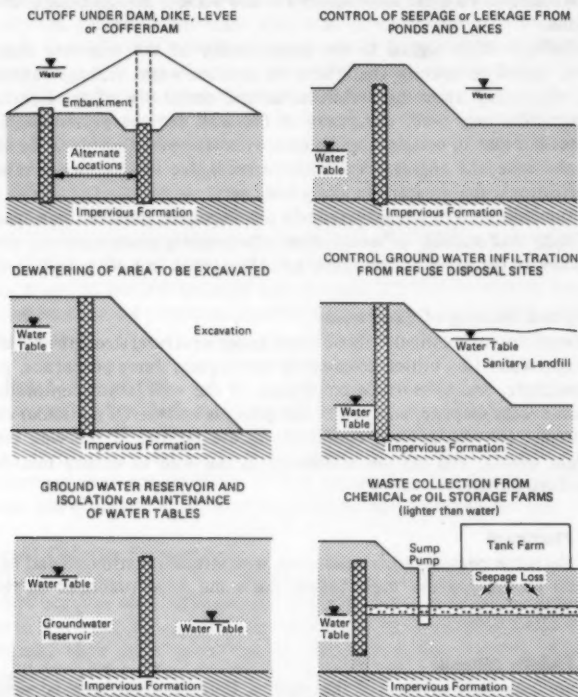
Typical Applications of Slurry Trench Cutoff Wall
